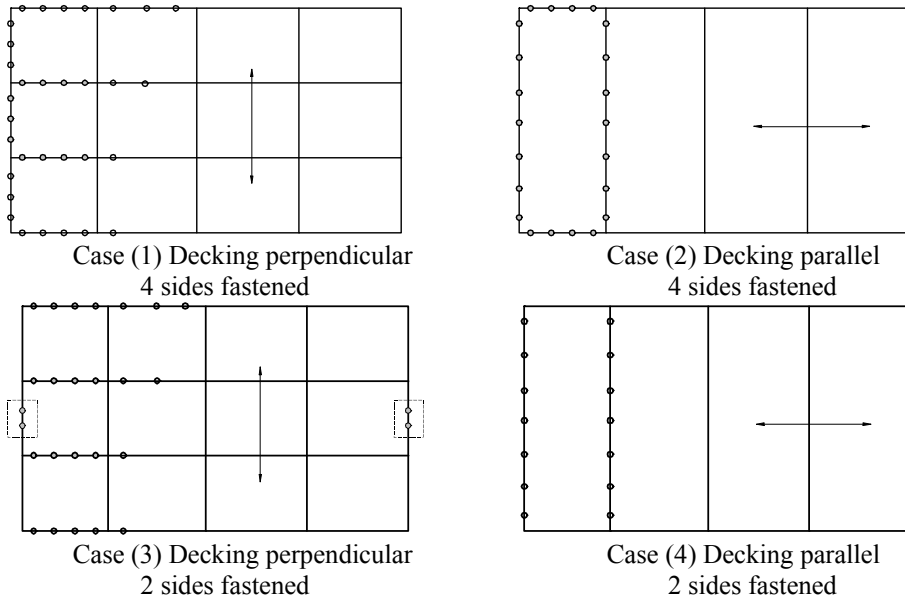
Arrangements of diaphragms of either 2 or 4 sides fastened to the supporting structure (ECCS, 1995)
